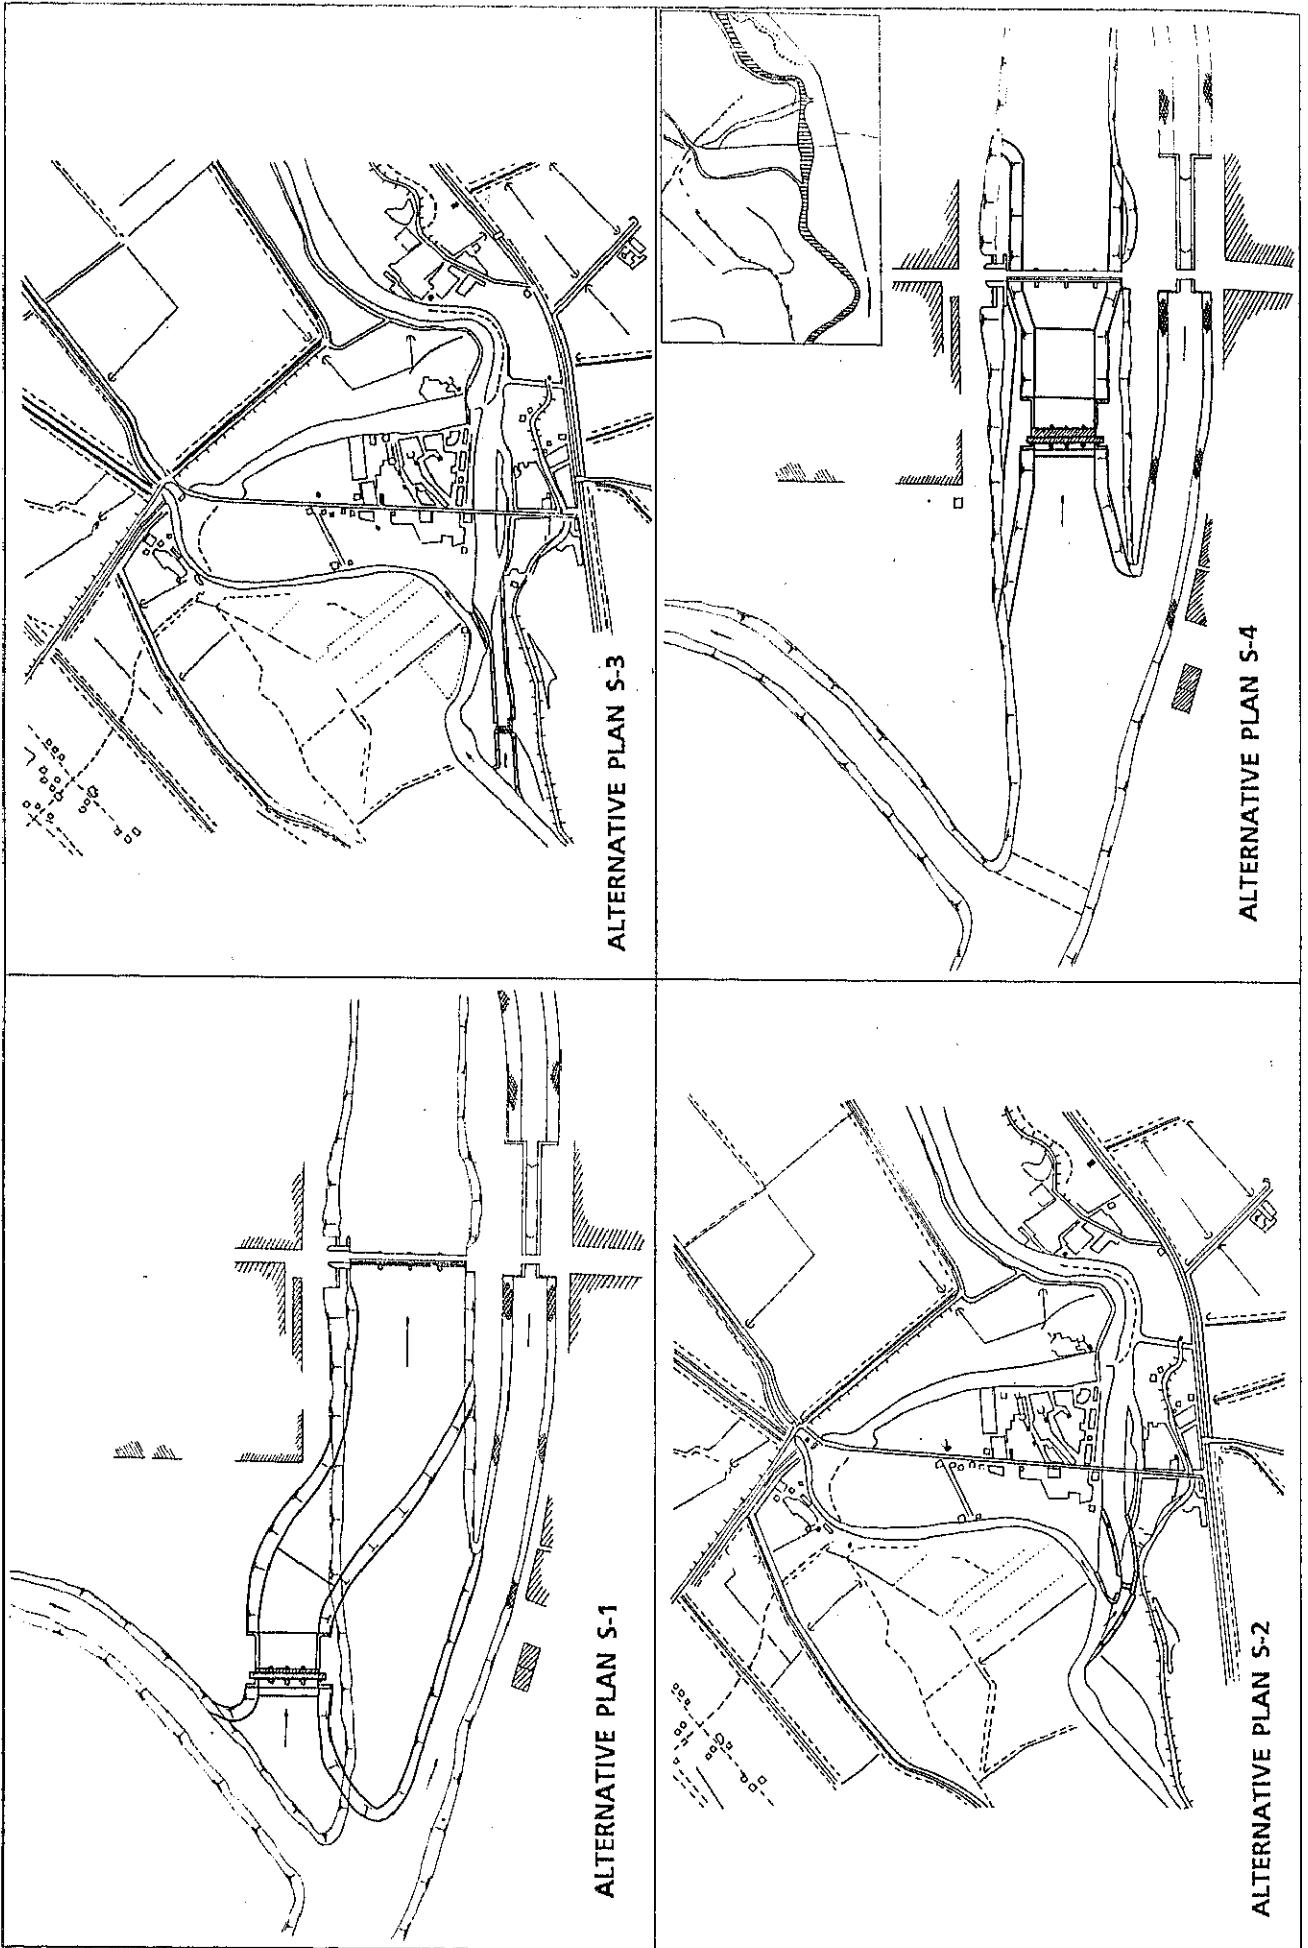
Alternative Plan of Proposed Site (Mazoura Regulator)
